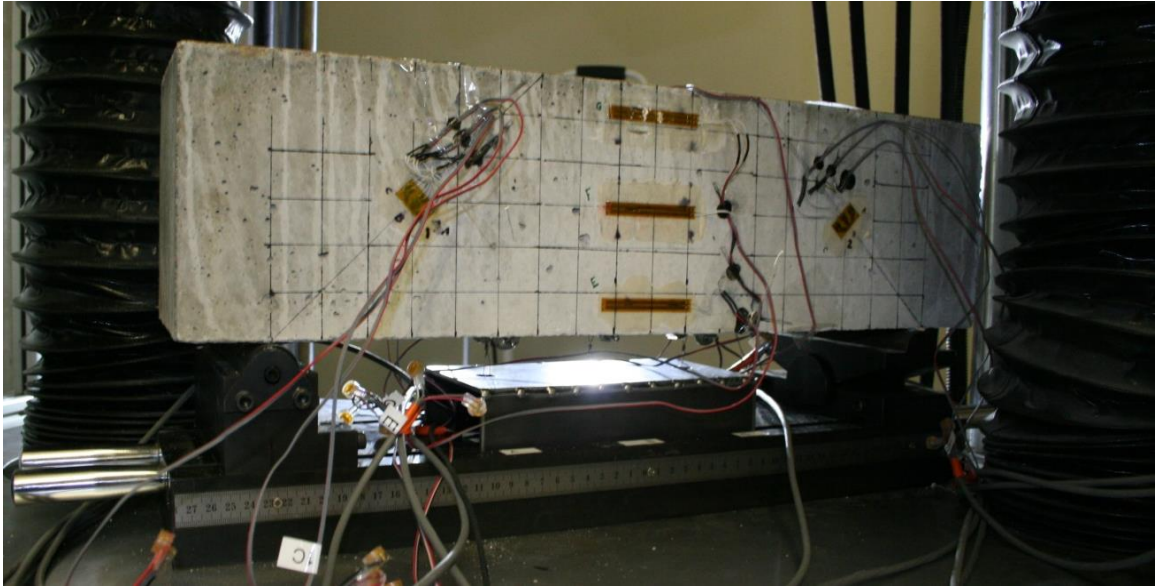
Test Setup for Test No. CFS-1 [18-in. (457-mm) Span]
